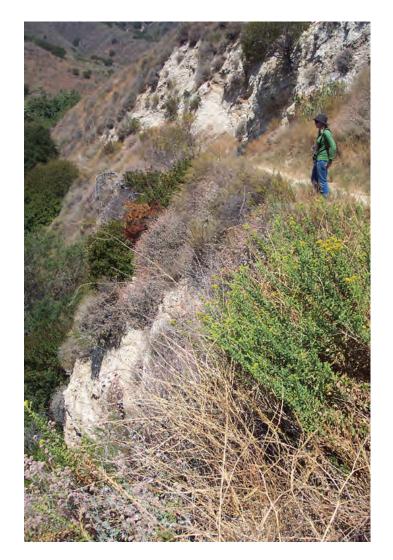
Existing trail along steep slope at Location 3, Corral Canyon.
